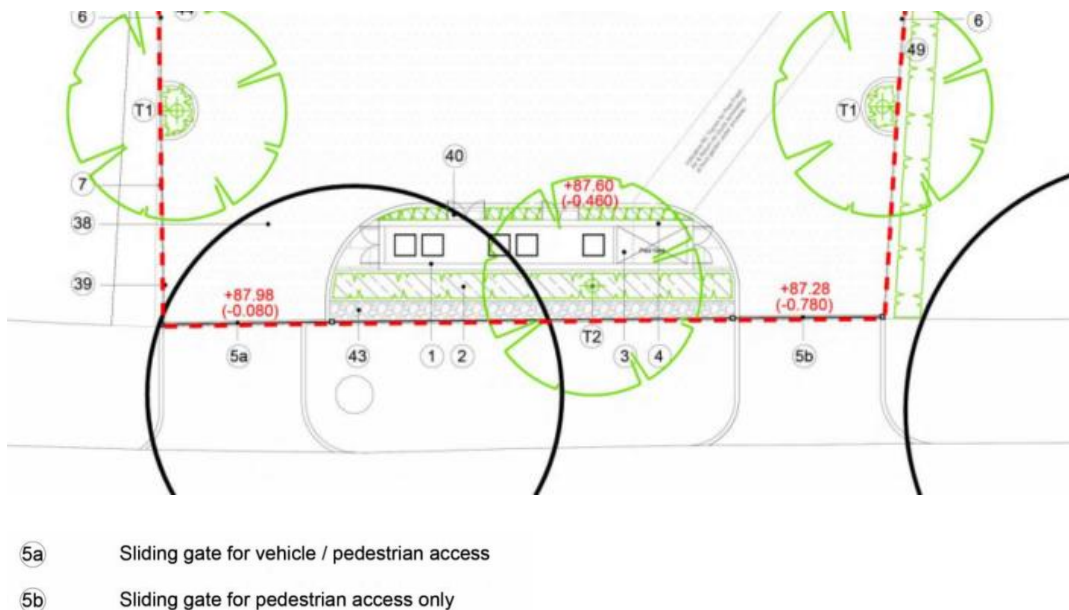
Approved landscaping plan (ref: 2021/5330/P) and excerpt from drawing key
